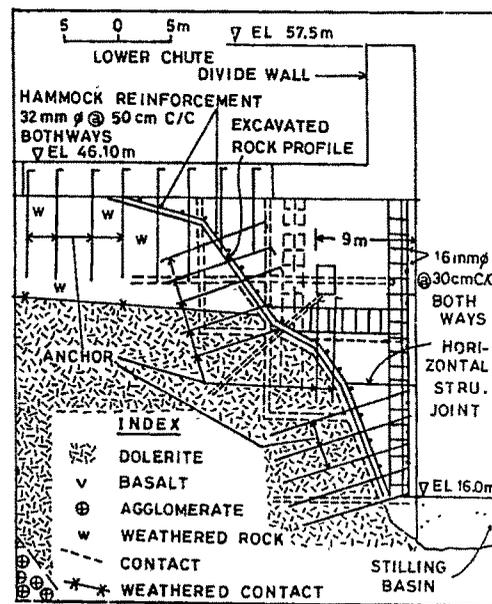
Typical section of left divide wall block-28 showing foundation treatment.
